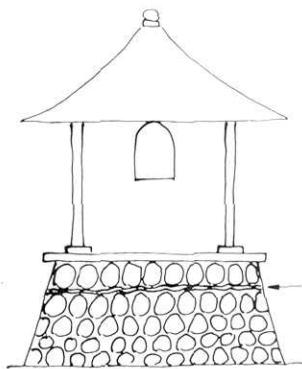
Cracks in the foundation of a bellfry.
